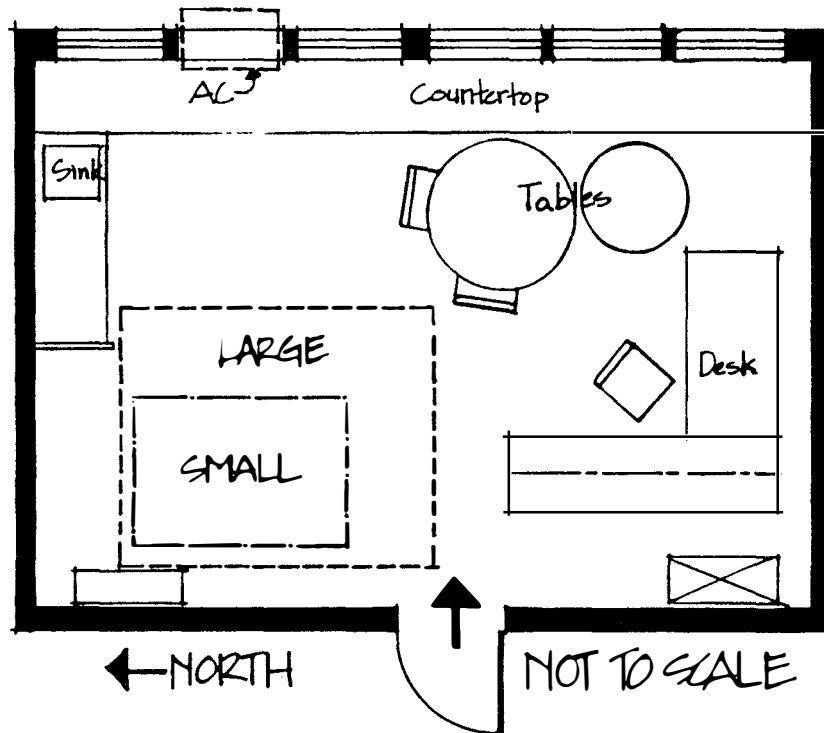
Floor plan of testing room with indications of locations of small and large structures.
